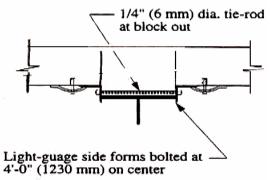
Bolted detail used in the New York Thruway Experimental Bridge
